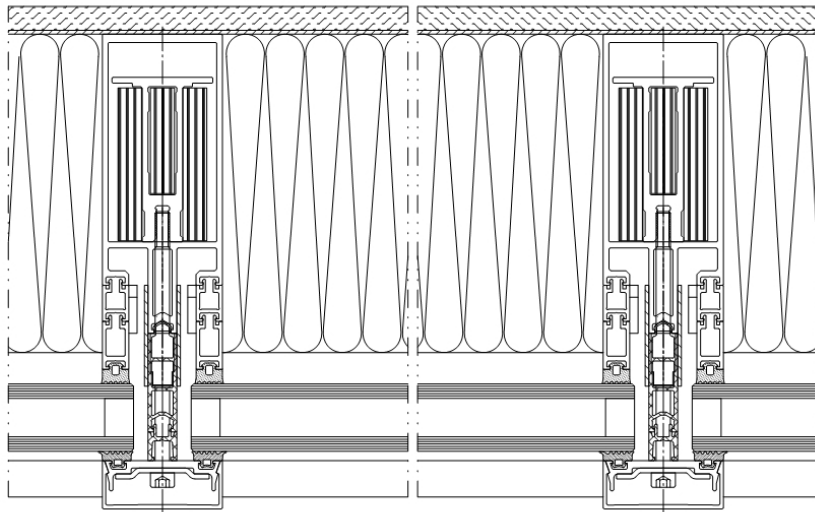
MB--SR50N EI EI60 system spandrel solution cross - section
